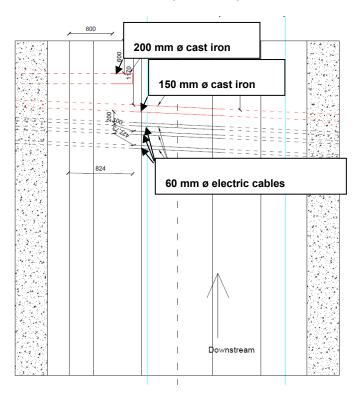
Plan View of the Pipe Crossing Sarah Curran Bridge
